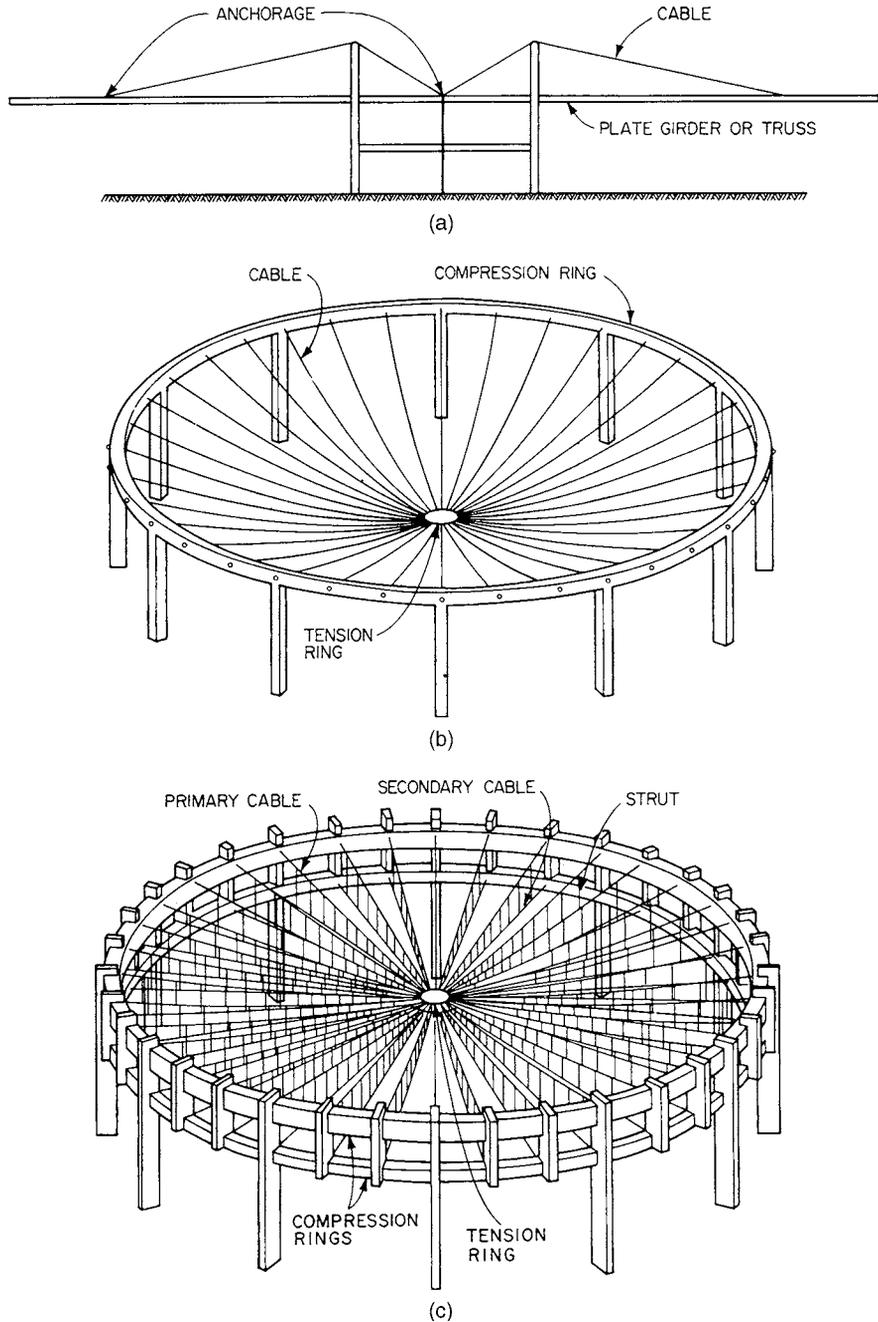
Cable roofs. (a) Cable-stayed cantilever roof; (b) single-layer cable-suspended roof; (c) double-layer cable-suspended roof.
